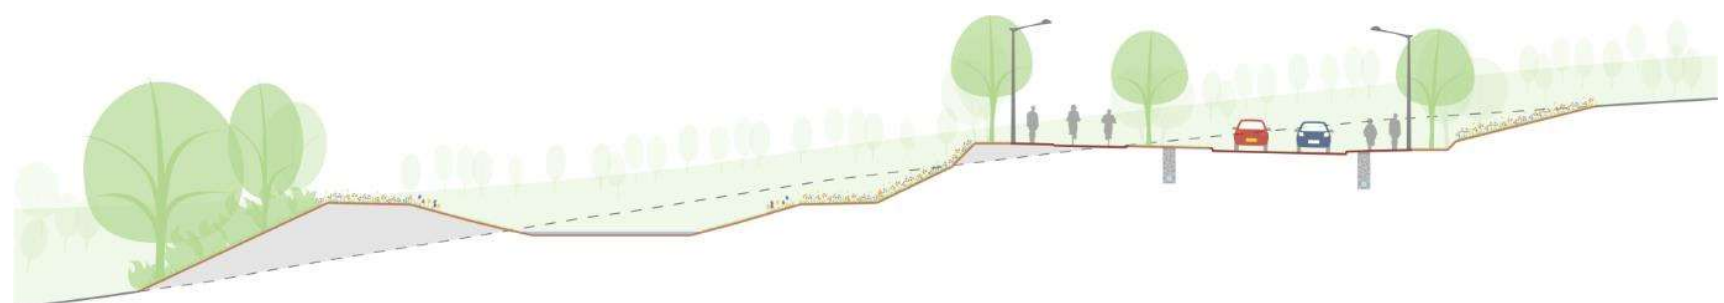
Typical section through Character Zone 1 (Section E-E from 1665_CSL_GEN_02MZ_DE_CH_0090 General Arrangement Sheet 2 of 6)
